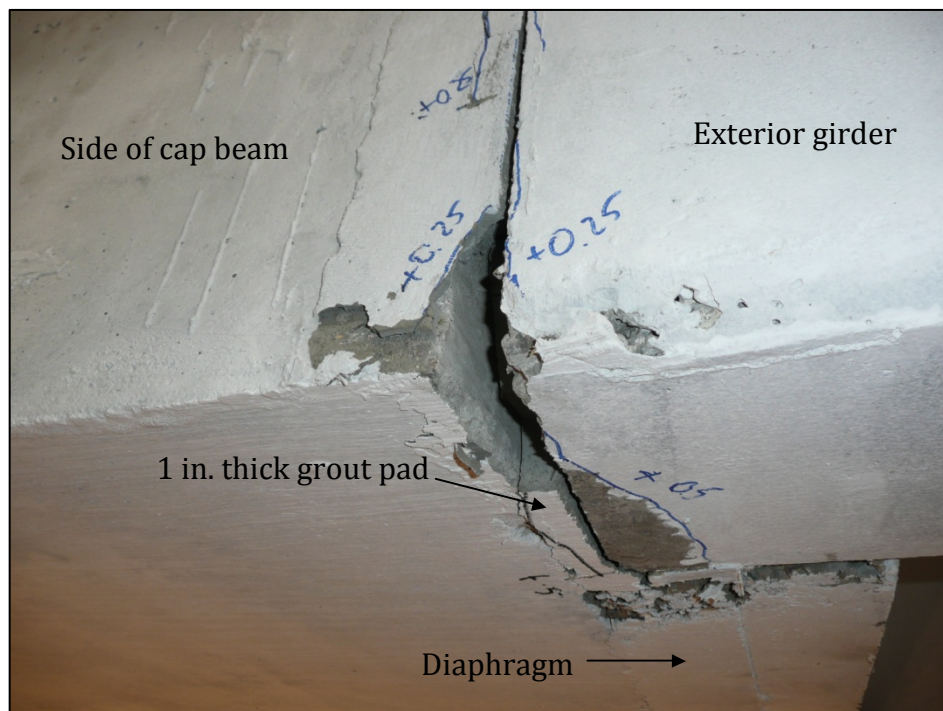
Partially Spalled Grout Pad at Girder-to-Cap Interface on the As-built Connection Side at +0.75 in. Displacement
